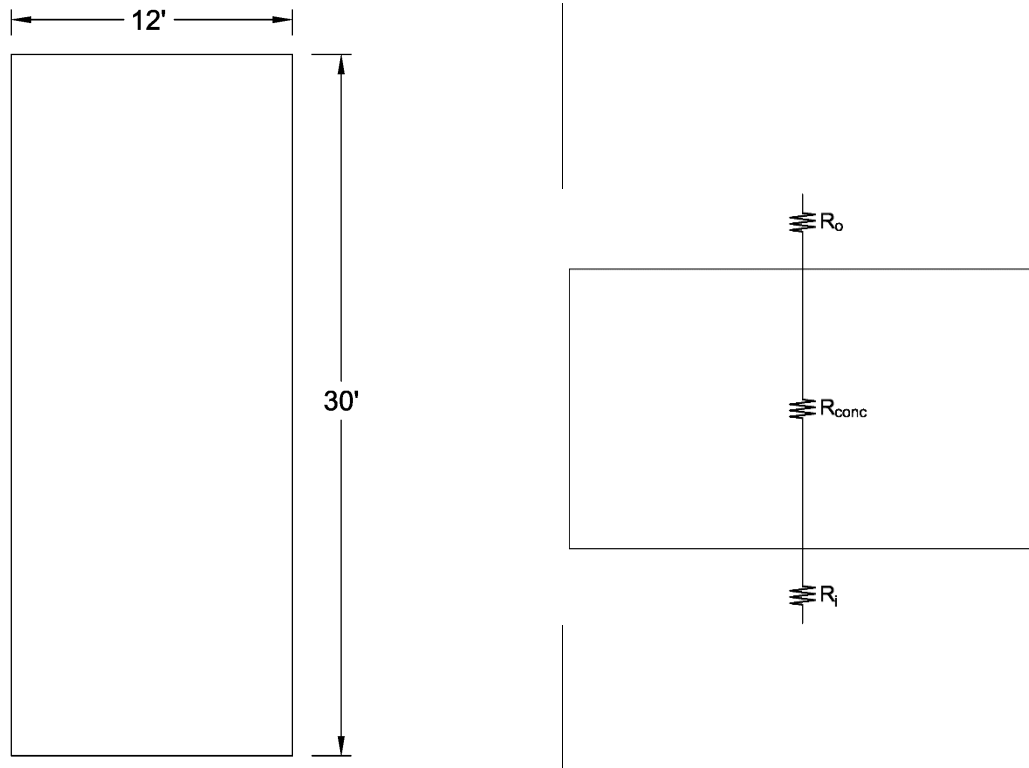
Solid section example panel layout and cross-section with electrical circuit analogy
